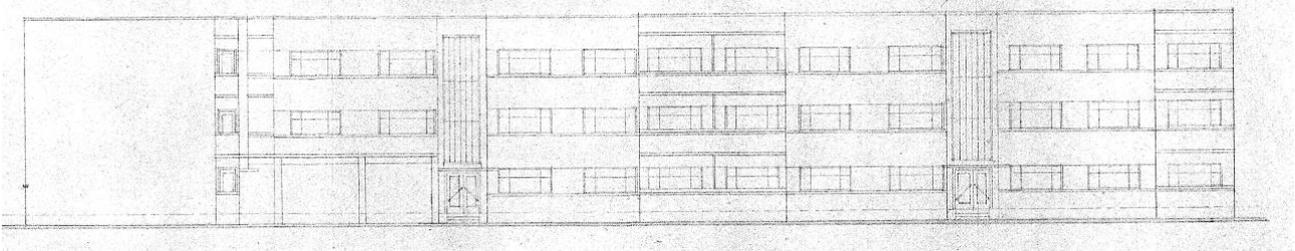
North elevation (Mordecai Benshemesh, 1951) (Source: Council Building File)
